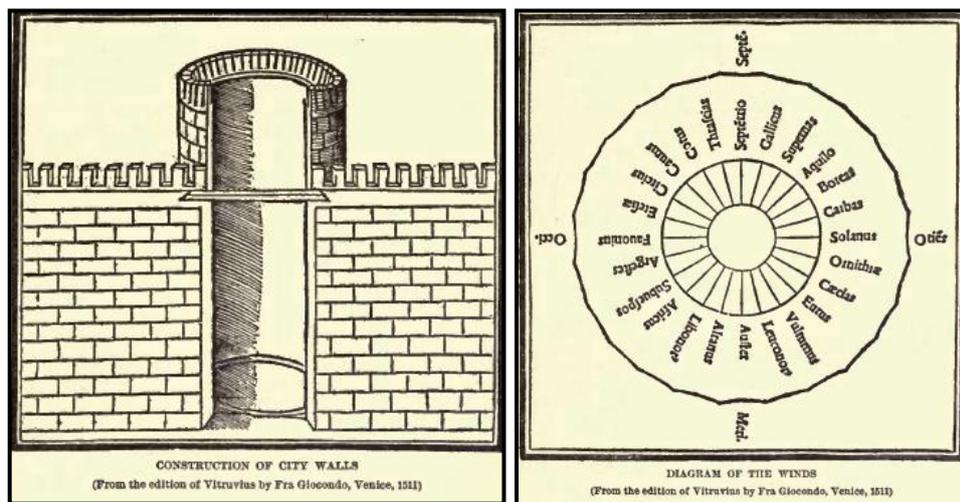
Construction of City Walls and Diagram of Winds from Vitruvius
